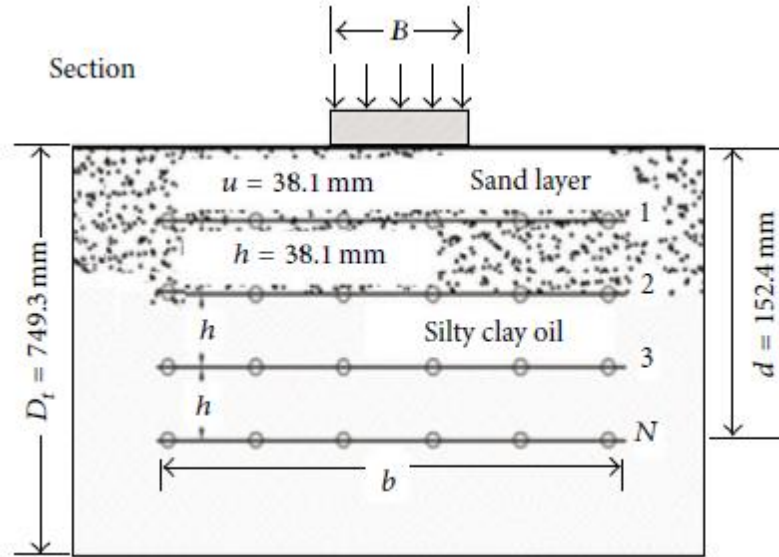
Shallow foundation model on geo-grid reinforced soil
